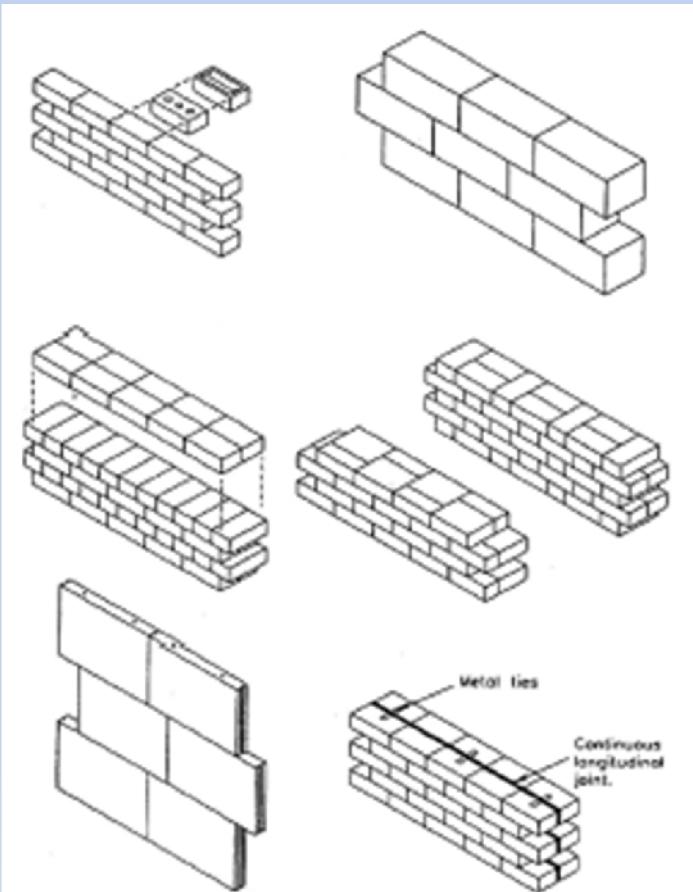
Examples of bonding arrangements using Group 1 masonry units.
